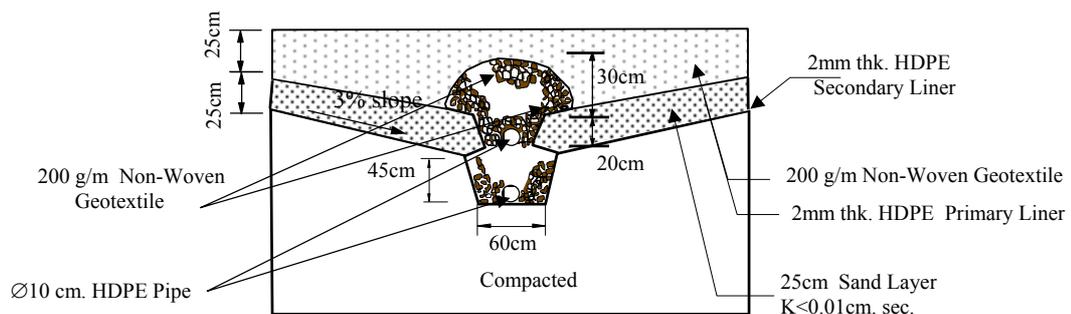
Details of the primary and secondary leachate collection system (Section B-B).
